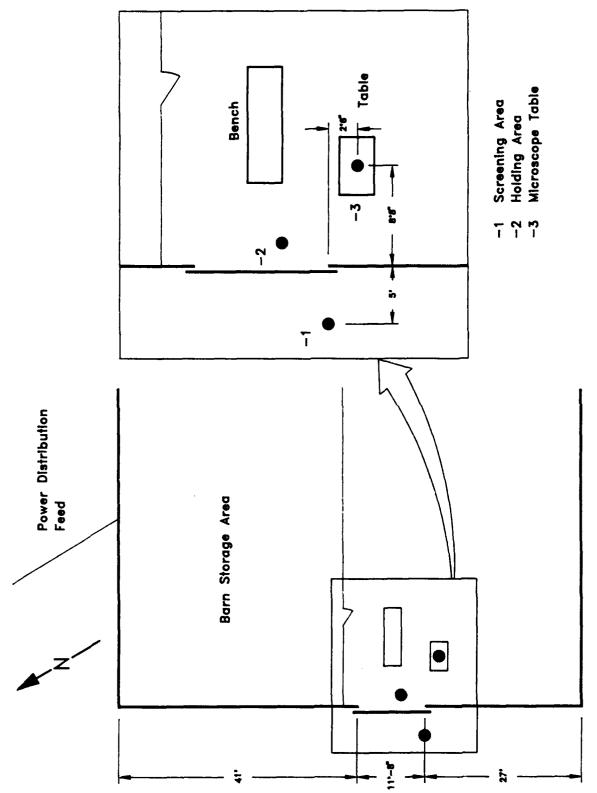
MEASUREMENT POINT AT FIRETOWER ROAD WORM COLLECTION SITE; 3S2-1.
